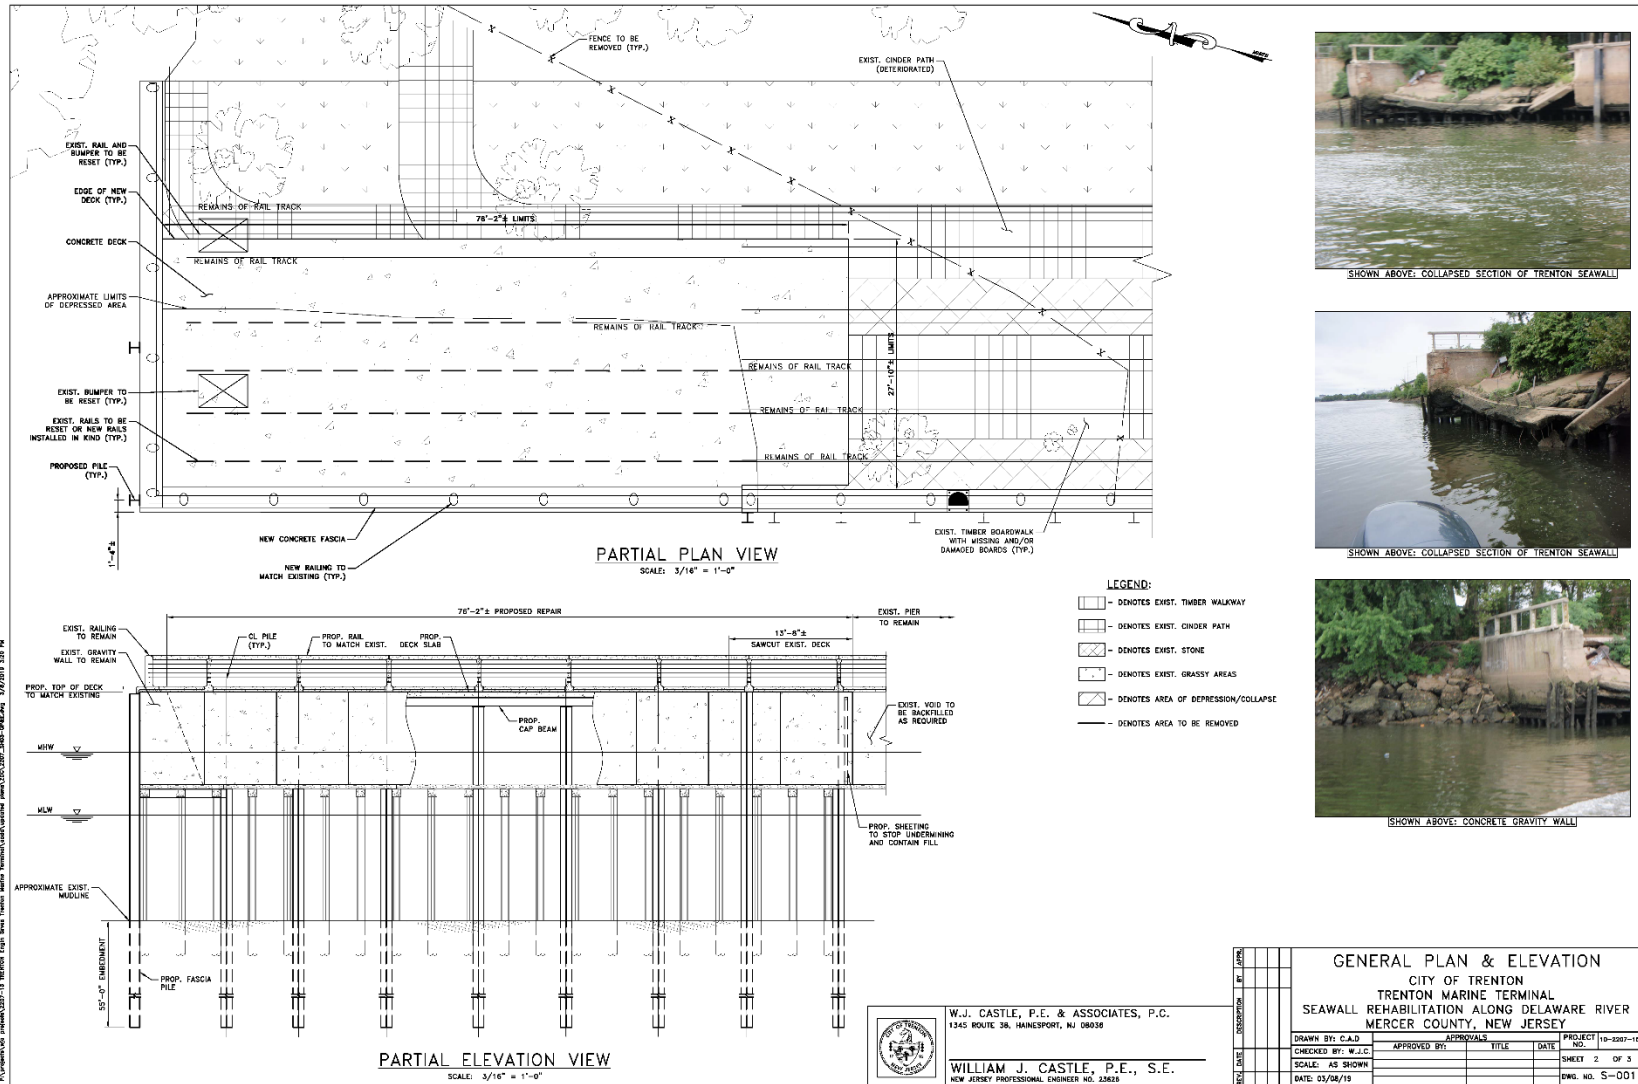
Trenton Marine Terminal Rehabilitation-General Plan and Elevation
